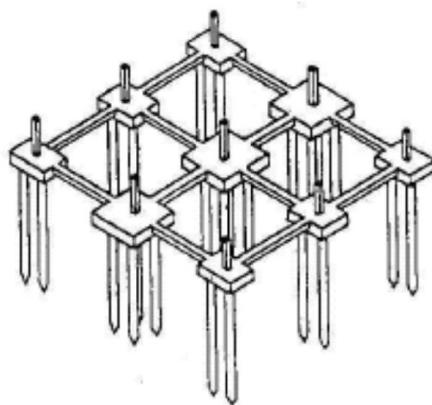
Schema of deep foundation with prefabricated piles.
